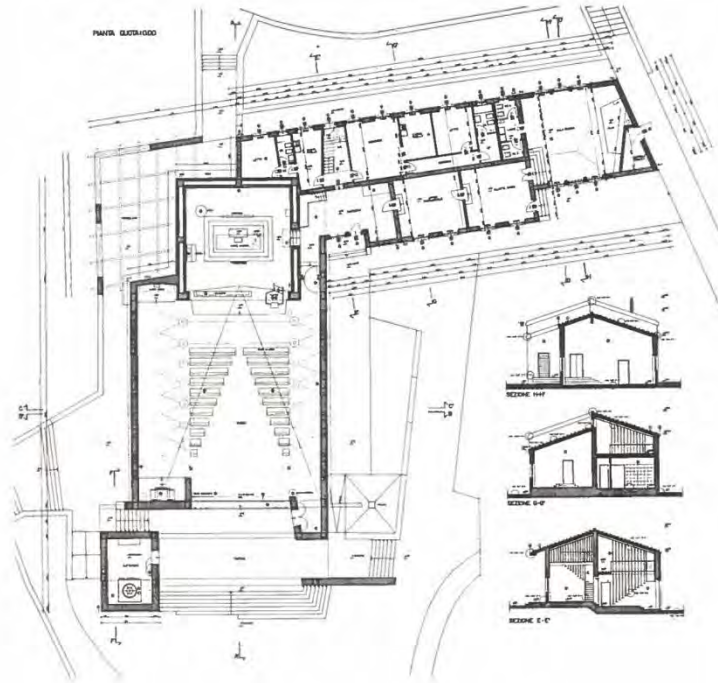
Plan of the church (Mauro Saito Architeti Archive)
